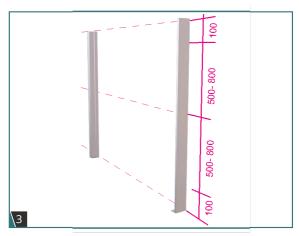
Drill mounting holes in the guides (10 cm from their edges). Mounting hole spacing should be in the range of 50-80 cm.
